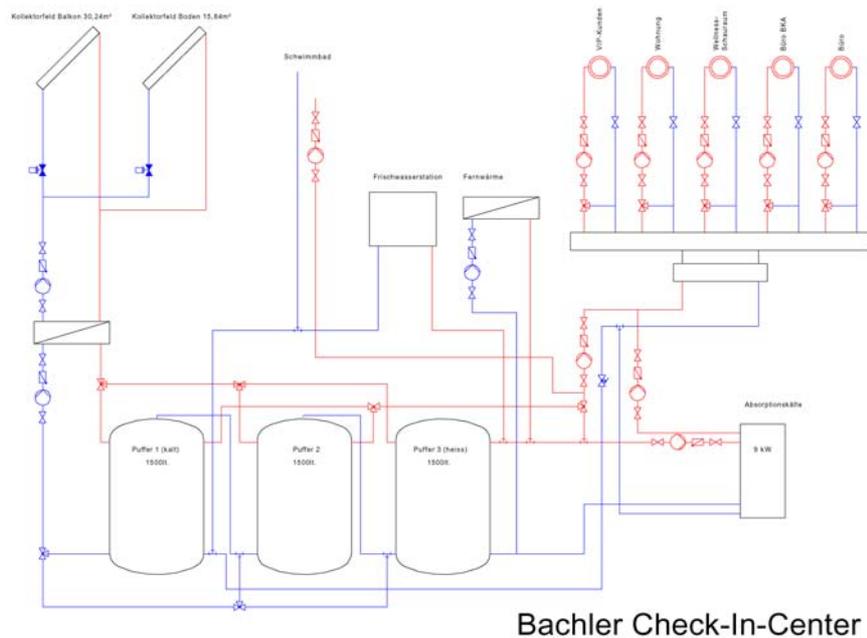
Simplified schematic view of the solar heating and cooling plant at Bachler Austria (source: Steiner-Haustechnik)
